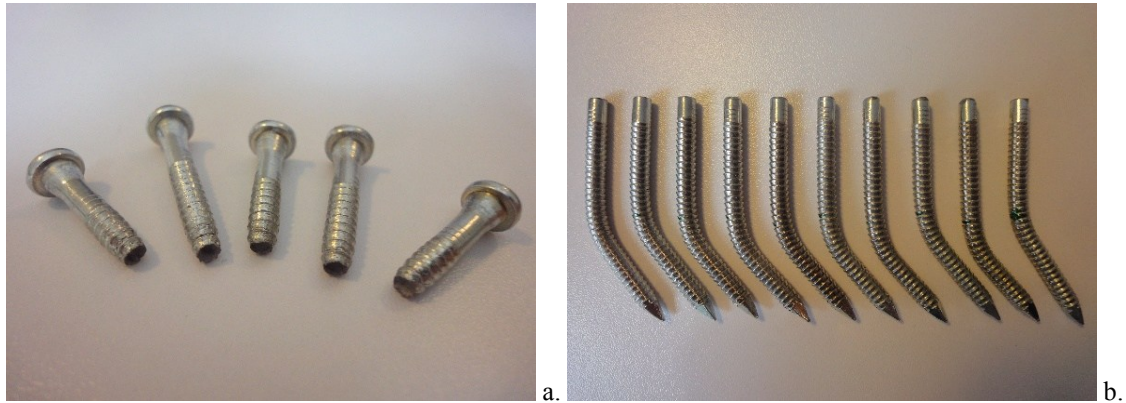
(a) Failure modes of the tension tests and (b) deformed fasteners after bending tests.
